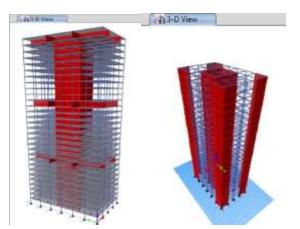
3D View of Outrigger structural System &3D View of Shear Wall structural system
